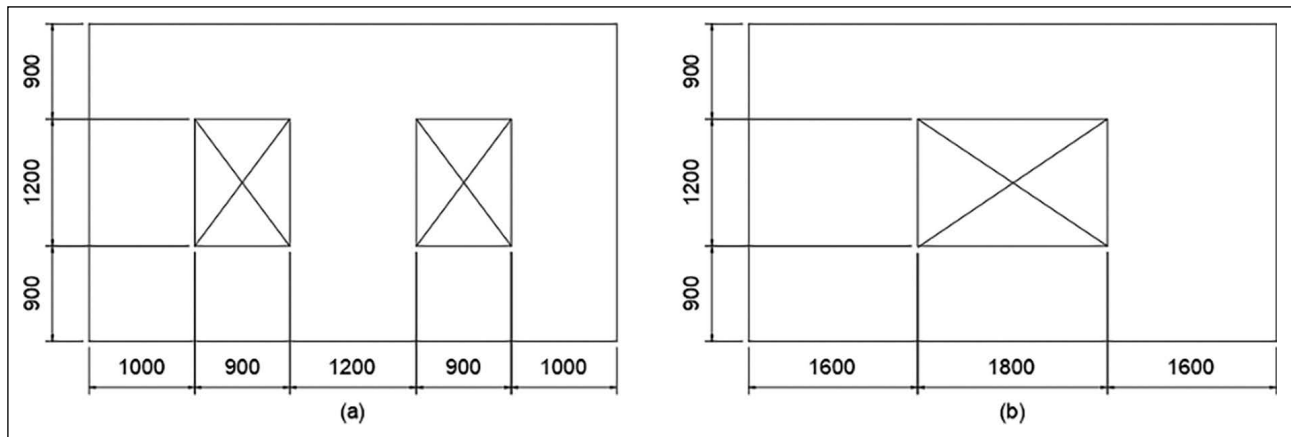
(a) Wooden shear wall type 1; (b) wooden shear wall type 2.
